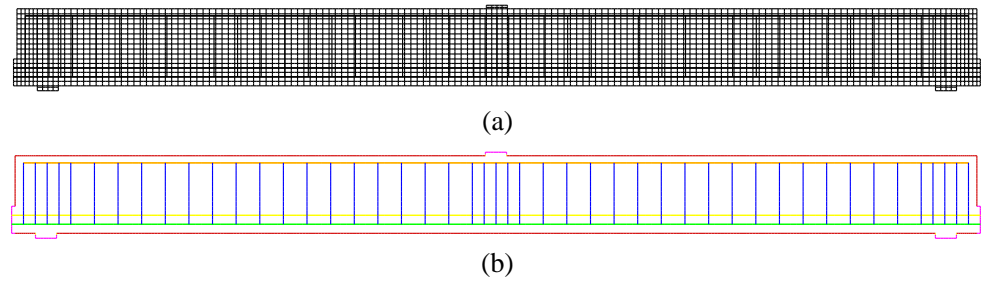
Case RB1. Dimensions adopted for the beam (in mm)
